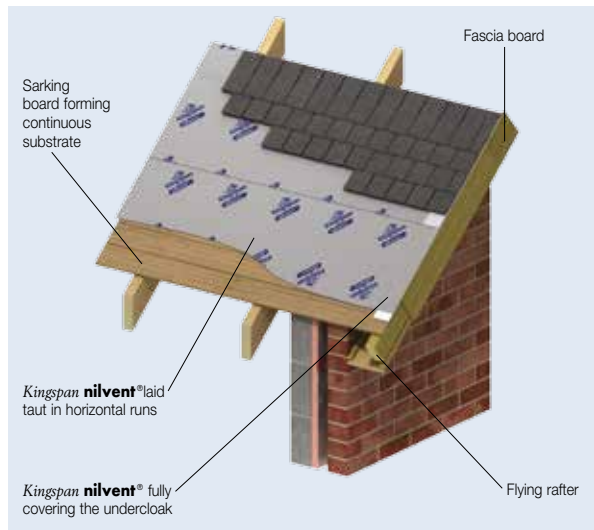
Verges – Fully Supported Horizontal Installation with Natural Slates
